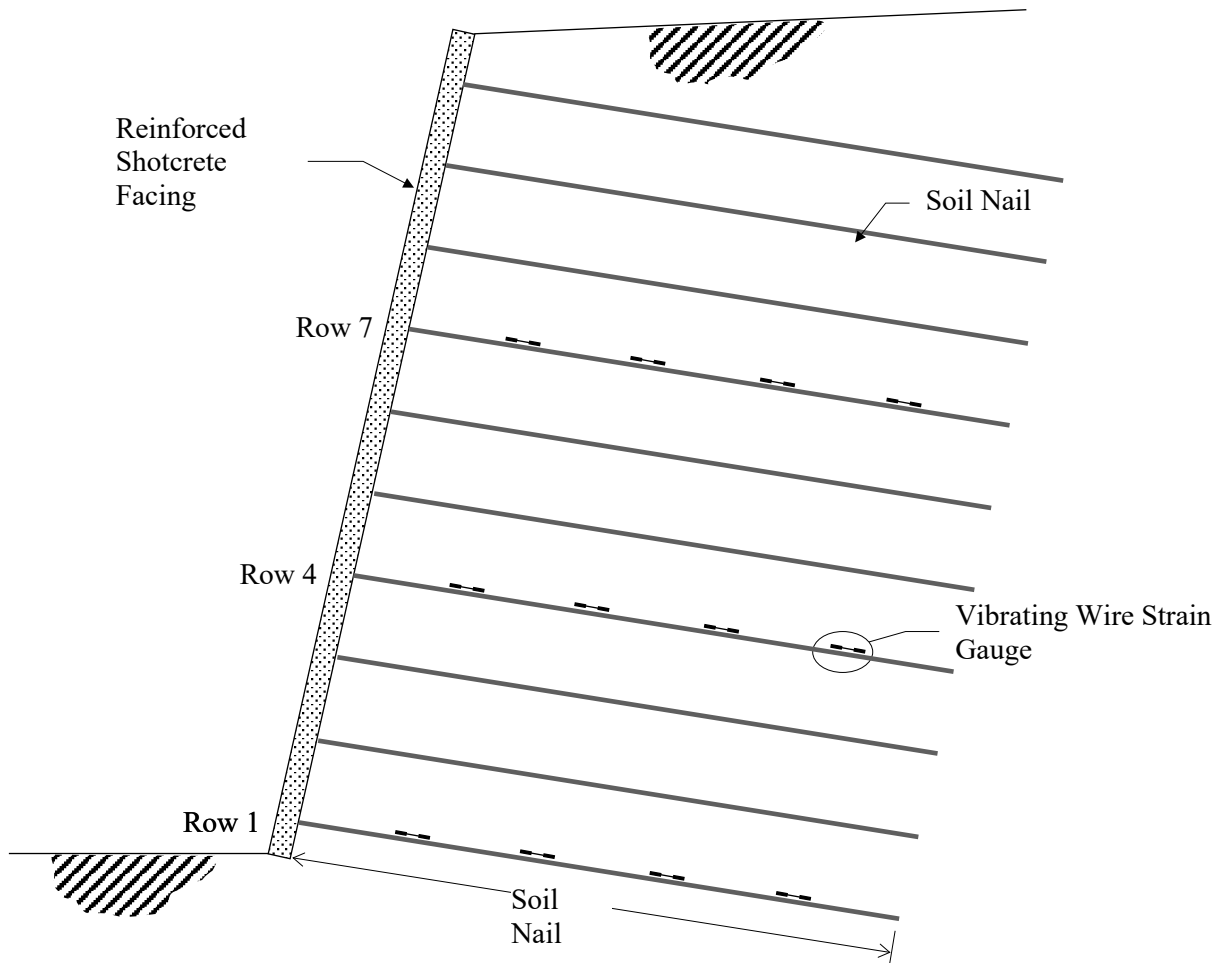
/E.1 – Typical Soil Nail Structure with Instrumentation
